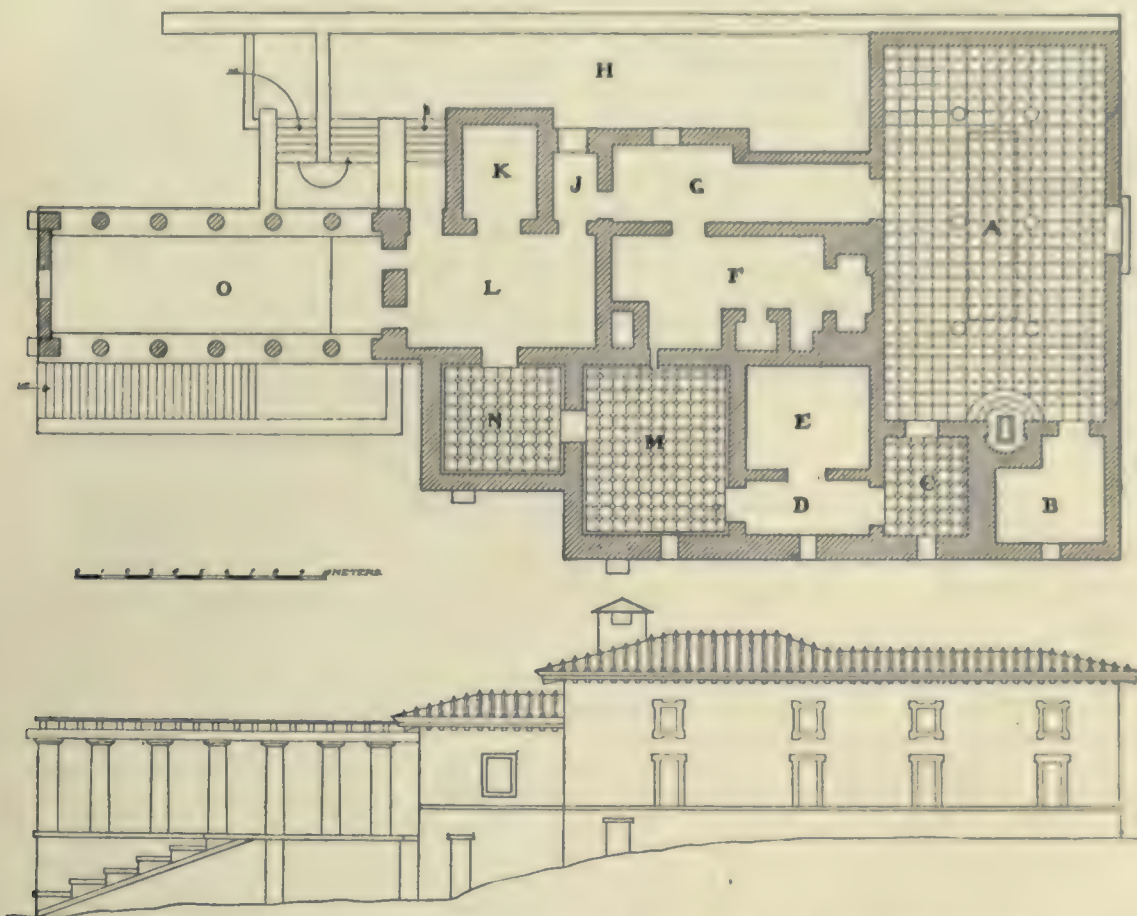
ARGIVE HERAEUM: ROMAN BUILDING (IX): PLAN AND ELEVATION RESTORED.
